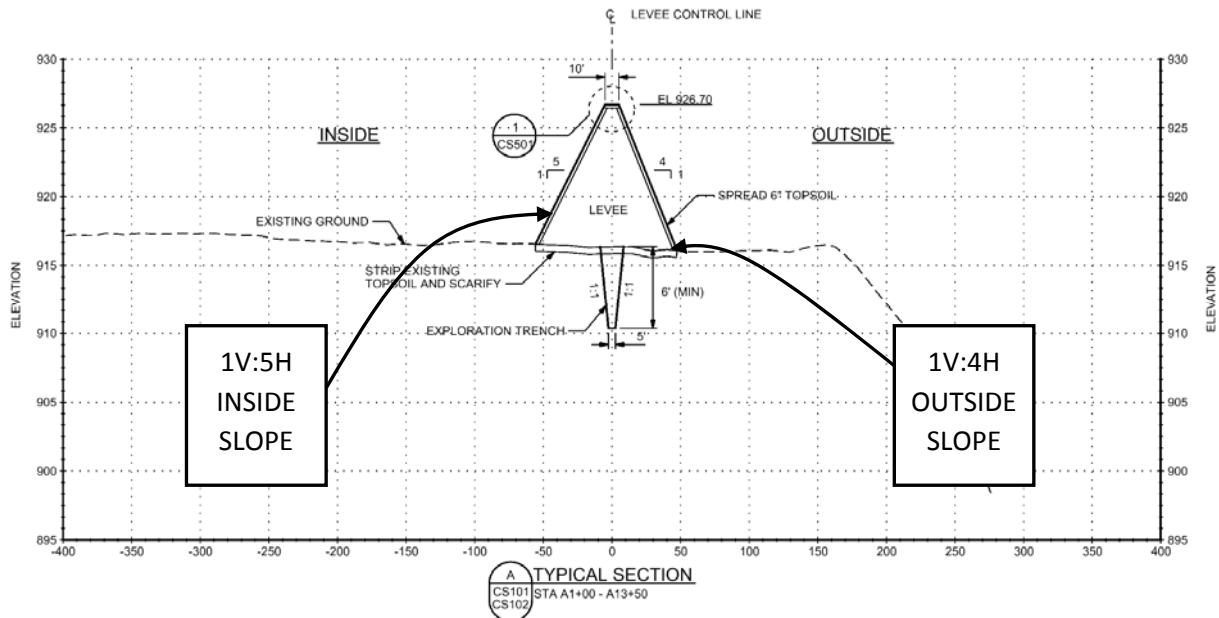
Preliminary Plan Drawing of a Typical Section of the OHB Levee.
